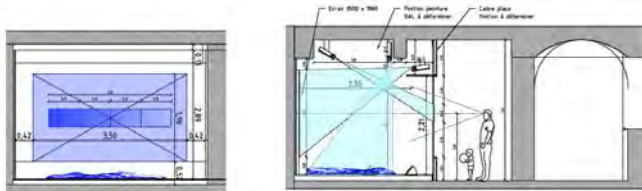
ROOM O.01 - Floor plan+tech for mixed projection display systems
